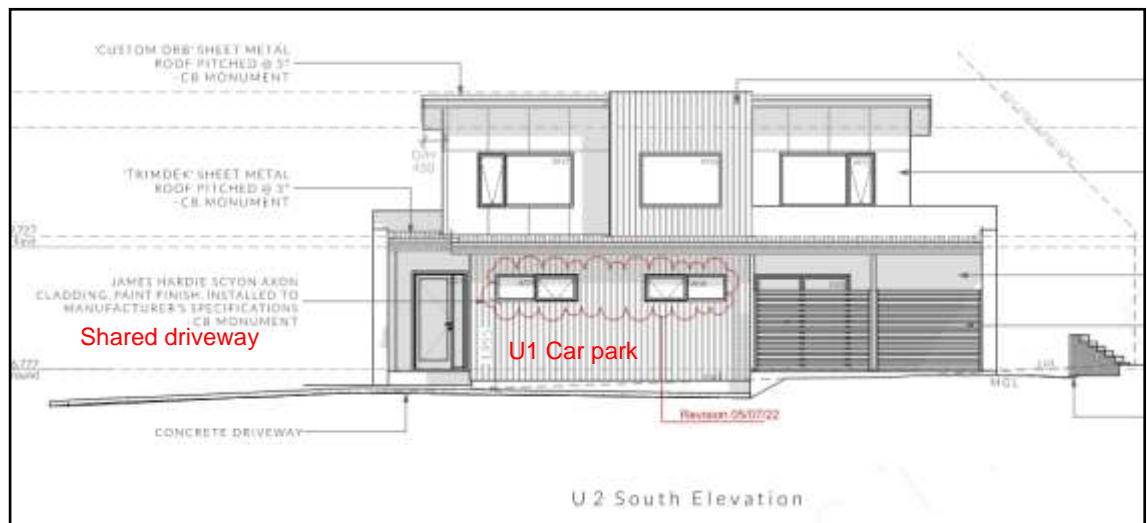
U2 South Elevation indicating W08, W09 adjacent to U1 car park
